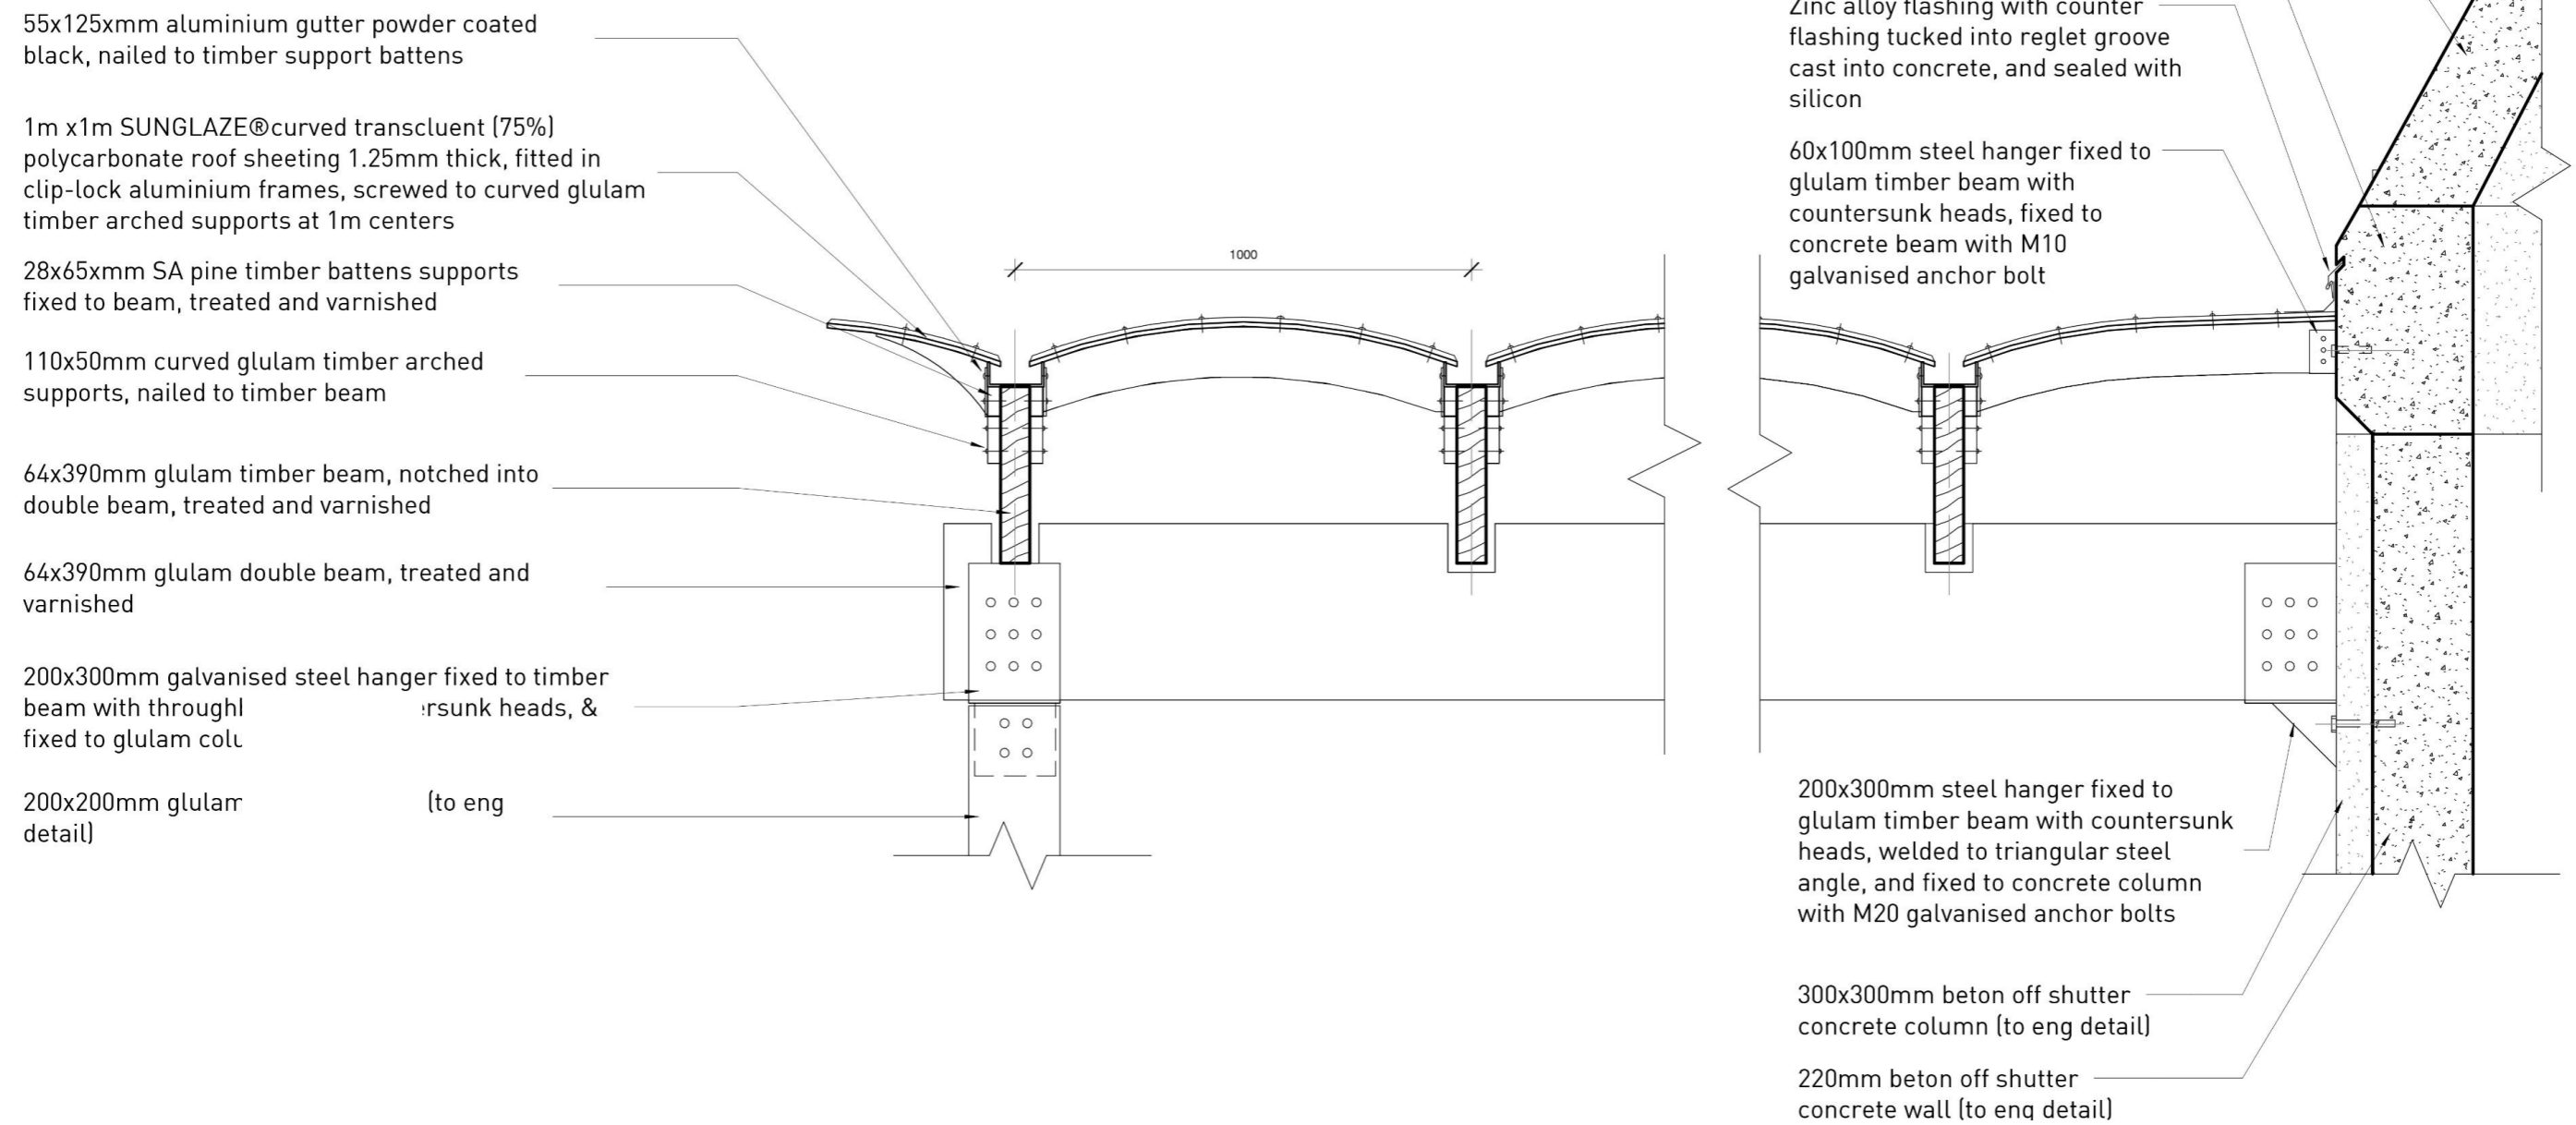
Detail of the pavilion roof structure and connection to concrete shell (Author 2022)
